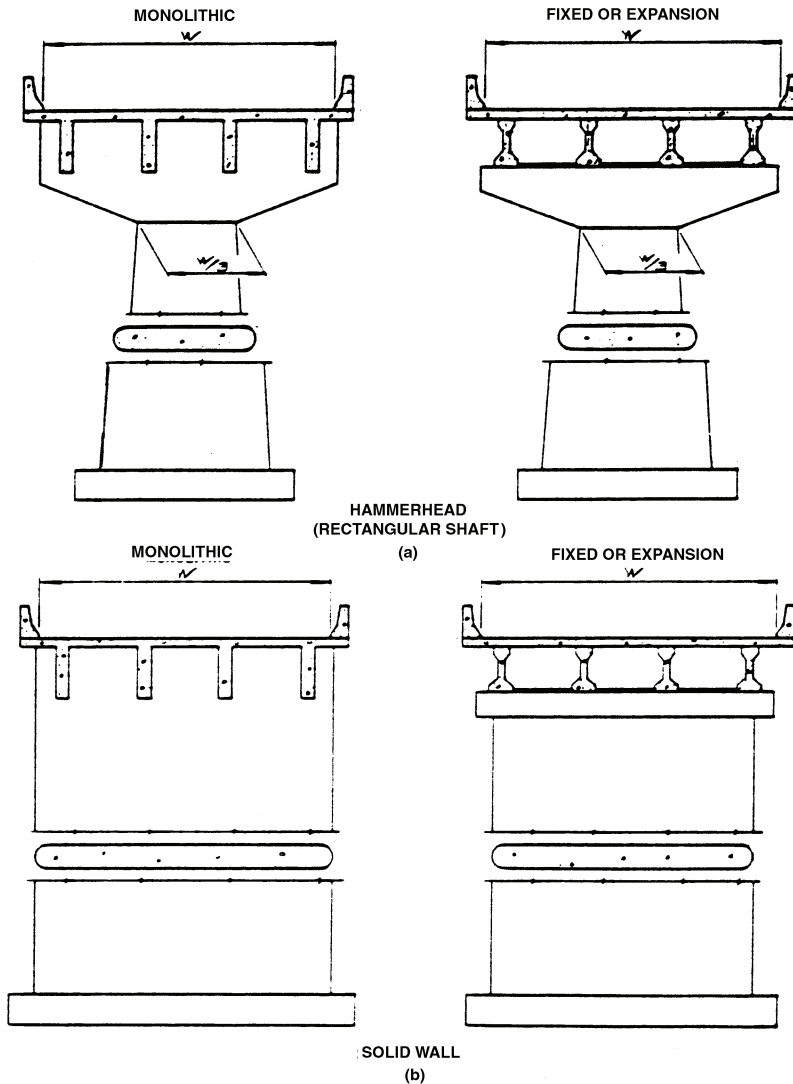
Typical pier types and configurations for river and waterway crossings.
